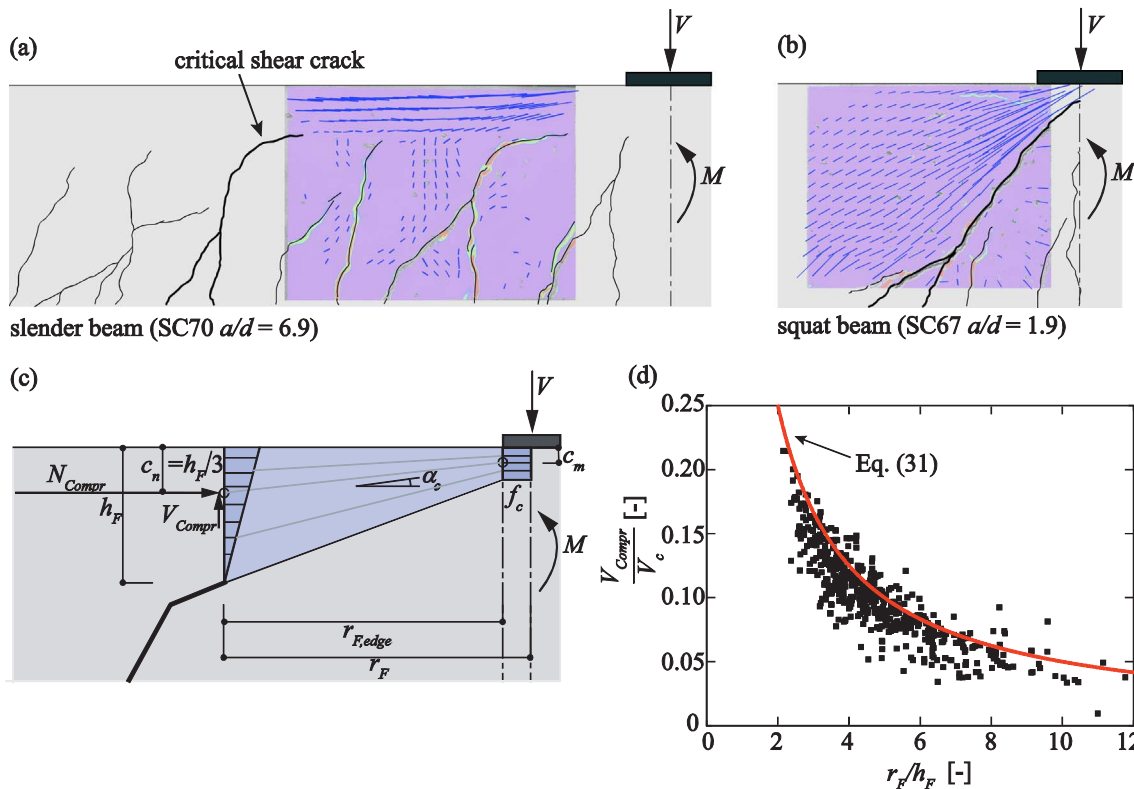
Crack pattern and principal compressive strains at failure load for (a) a slender beam (specimen SC70) and (b) a squat beam (specimen SC67) (adapted from Cavagnis et al. [11]); (c) hypothesis of a stress field used to determine the contribution to the shear strength of the compression zone; (d) calculated contribution of the compression zone with respect to the calculated shear capacity as a function of the distance between the tip of the crack and the axis where the load is applied (tests included in the database by Reineck et al. [31], assuming  $x_A = 0.5\alpha$ ).
